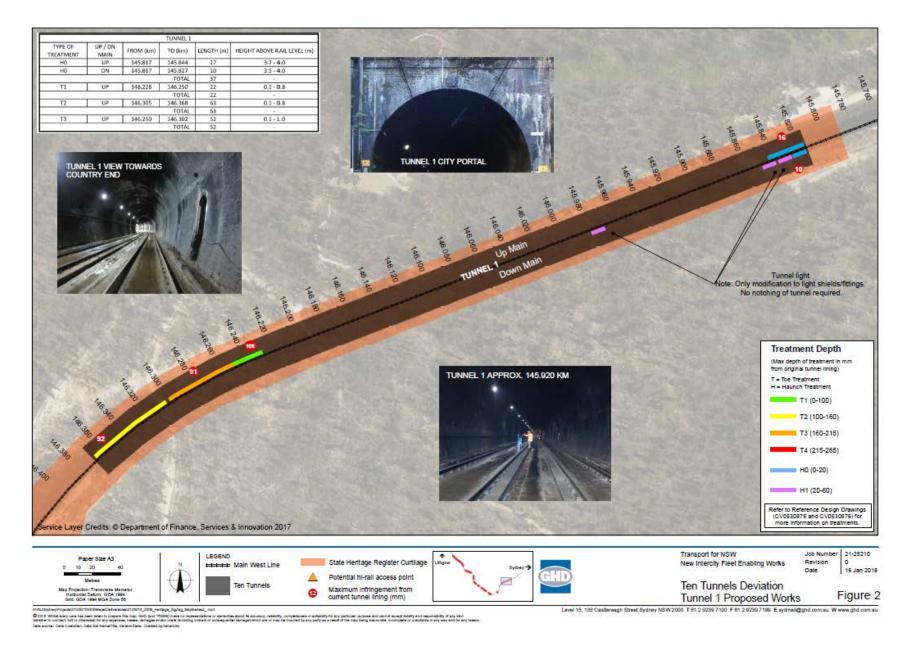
Proposed treatment overview for Tunnel 1 (GHD Great Zig Zag Railway deviation tunnels Heritage Design Summary 2018)
